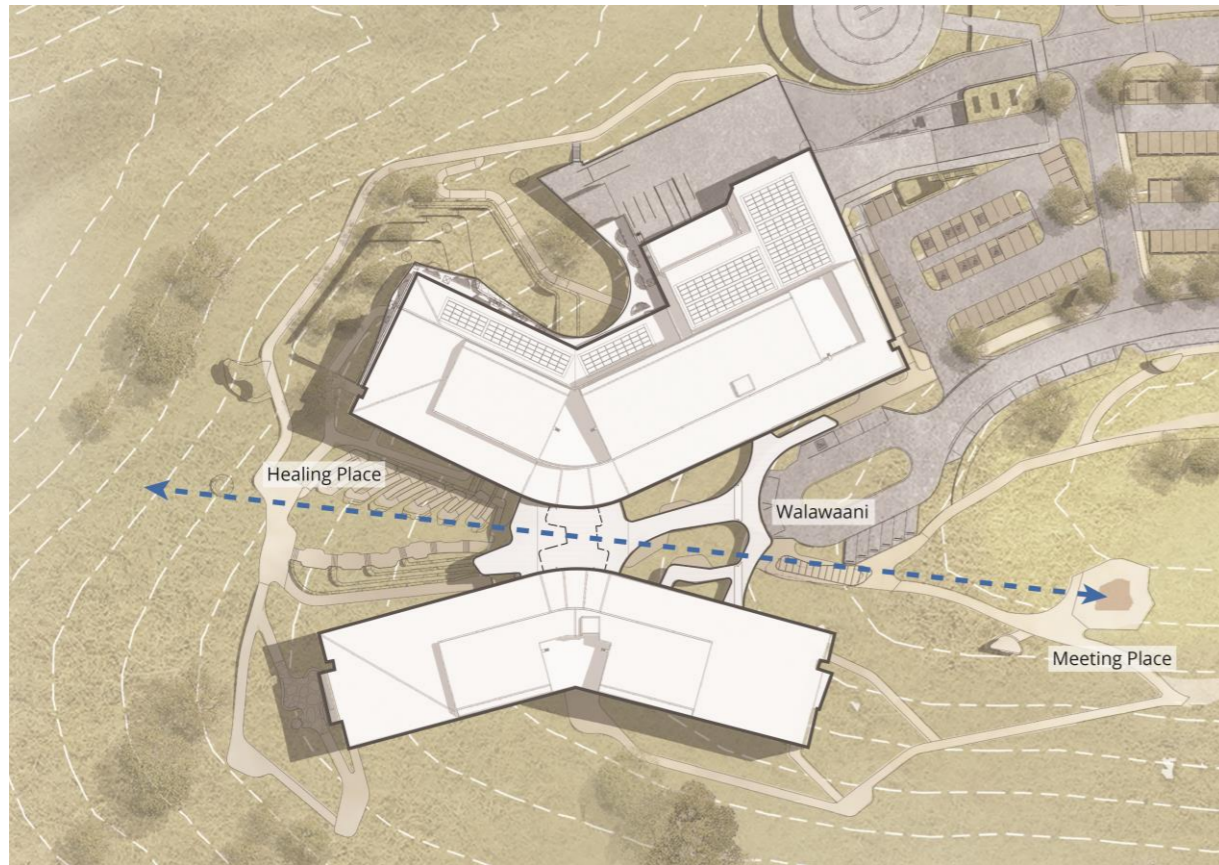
SITE PLAN DIAGRAM – WITH FOCUSED VIEW CORRIDOR INDICATED
